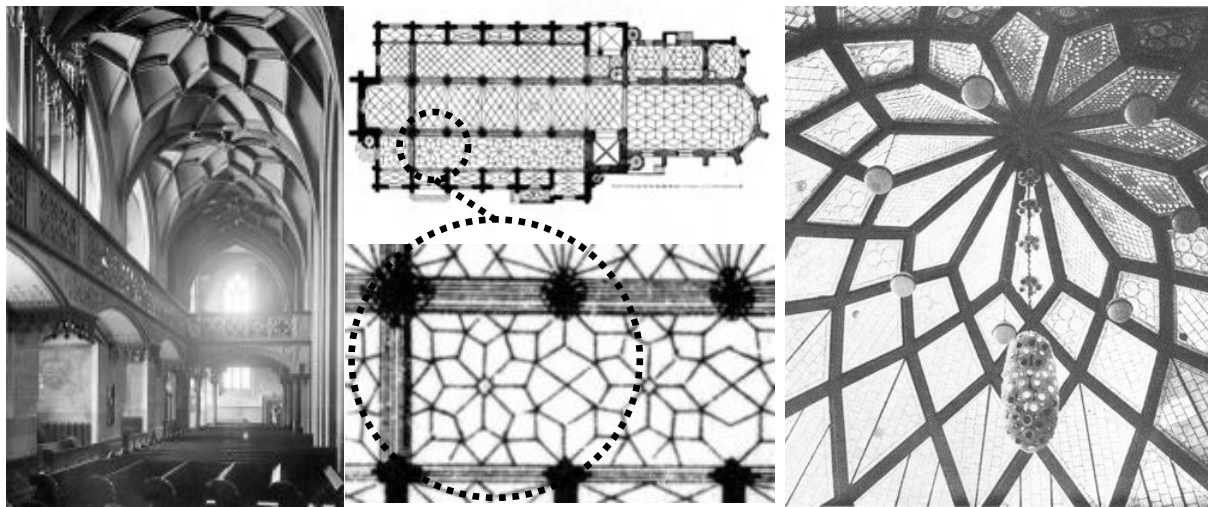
Left – Interior of Stuttgart's *Stiftskirche* showing the south aisle with its original vaulting. Source: <http://www.stiftskirche.de> Centre – Plan of Stuttgart's *Stiftskirche* with an enlarged portion showing the layout of the rib vaulting above the south aisle. Source: Georg Dehio & Gustav von Bezold, *Die Kirchliche Baukunst des Abendlandes* (Stuttgart: Arnold Bergsträsser Verlag, 1901)
